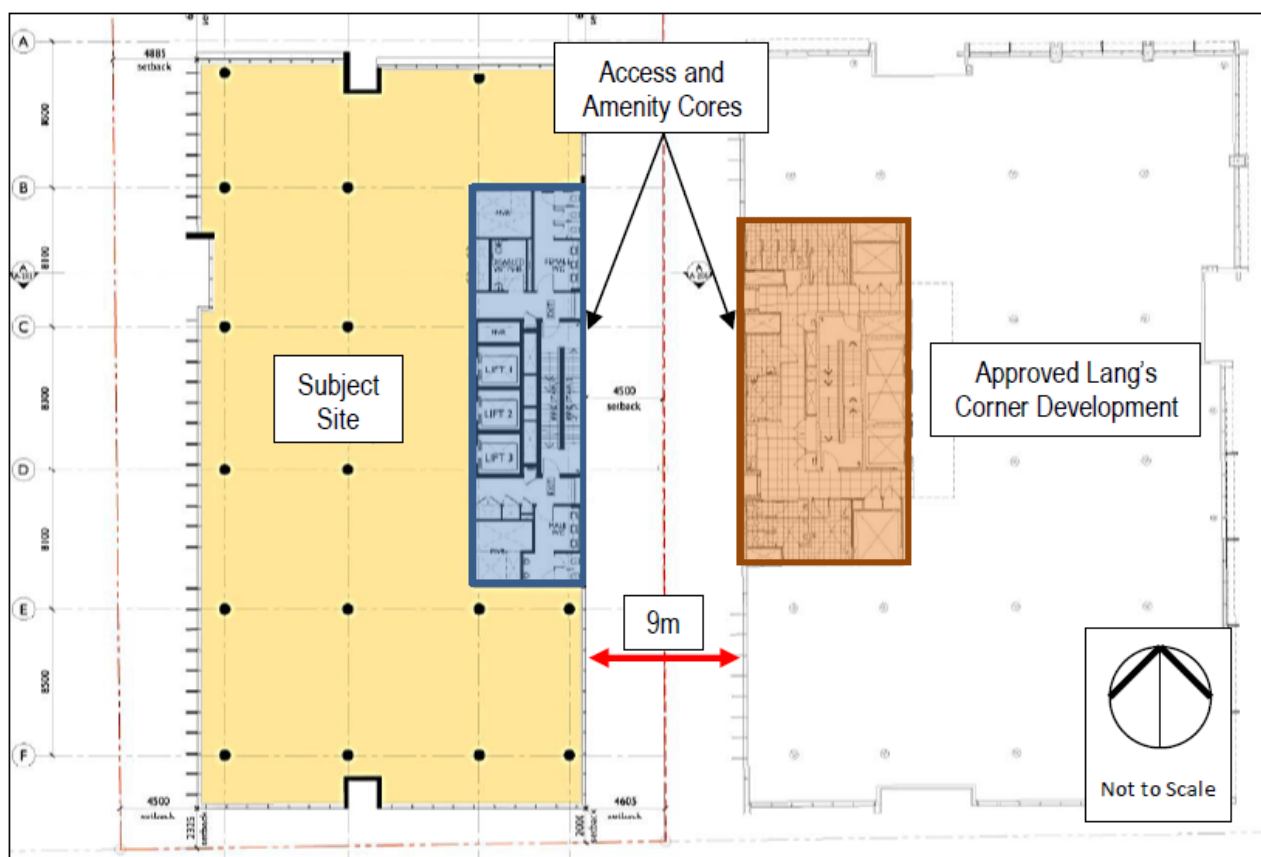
Proposed building separation showing location of Amenity Cores (levels 3-10) Source: ADM Architects
